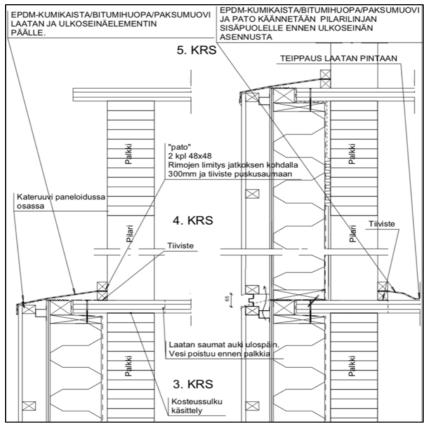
EPDM-rubber strip and water block protections for facade elements and for column connection points.
